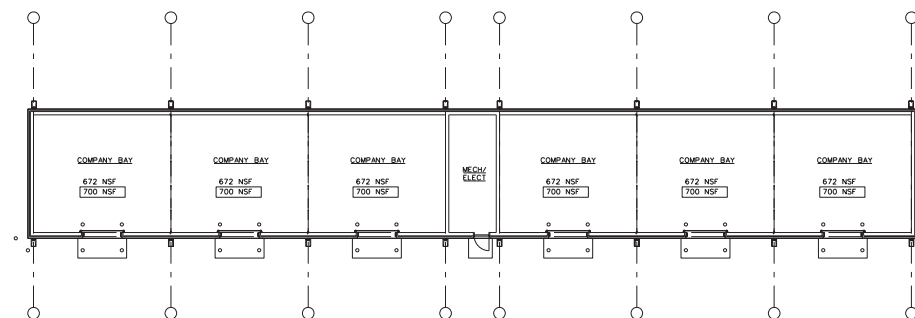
Conceptual Patriot Battalion Deployment Storage Floor-Plan
